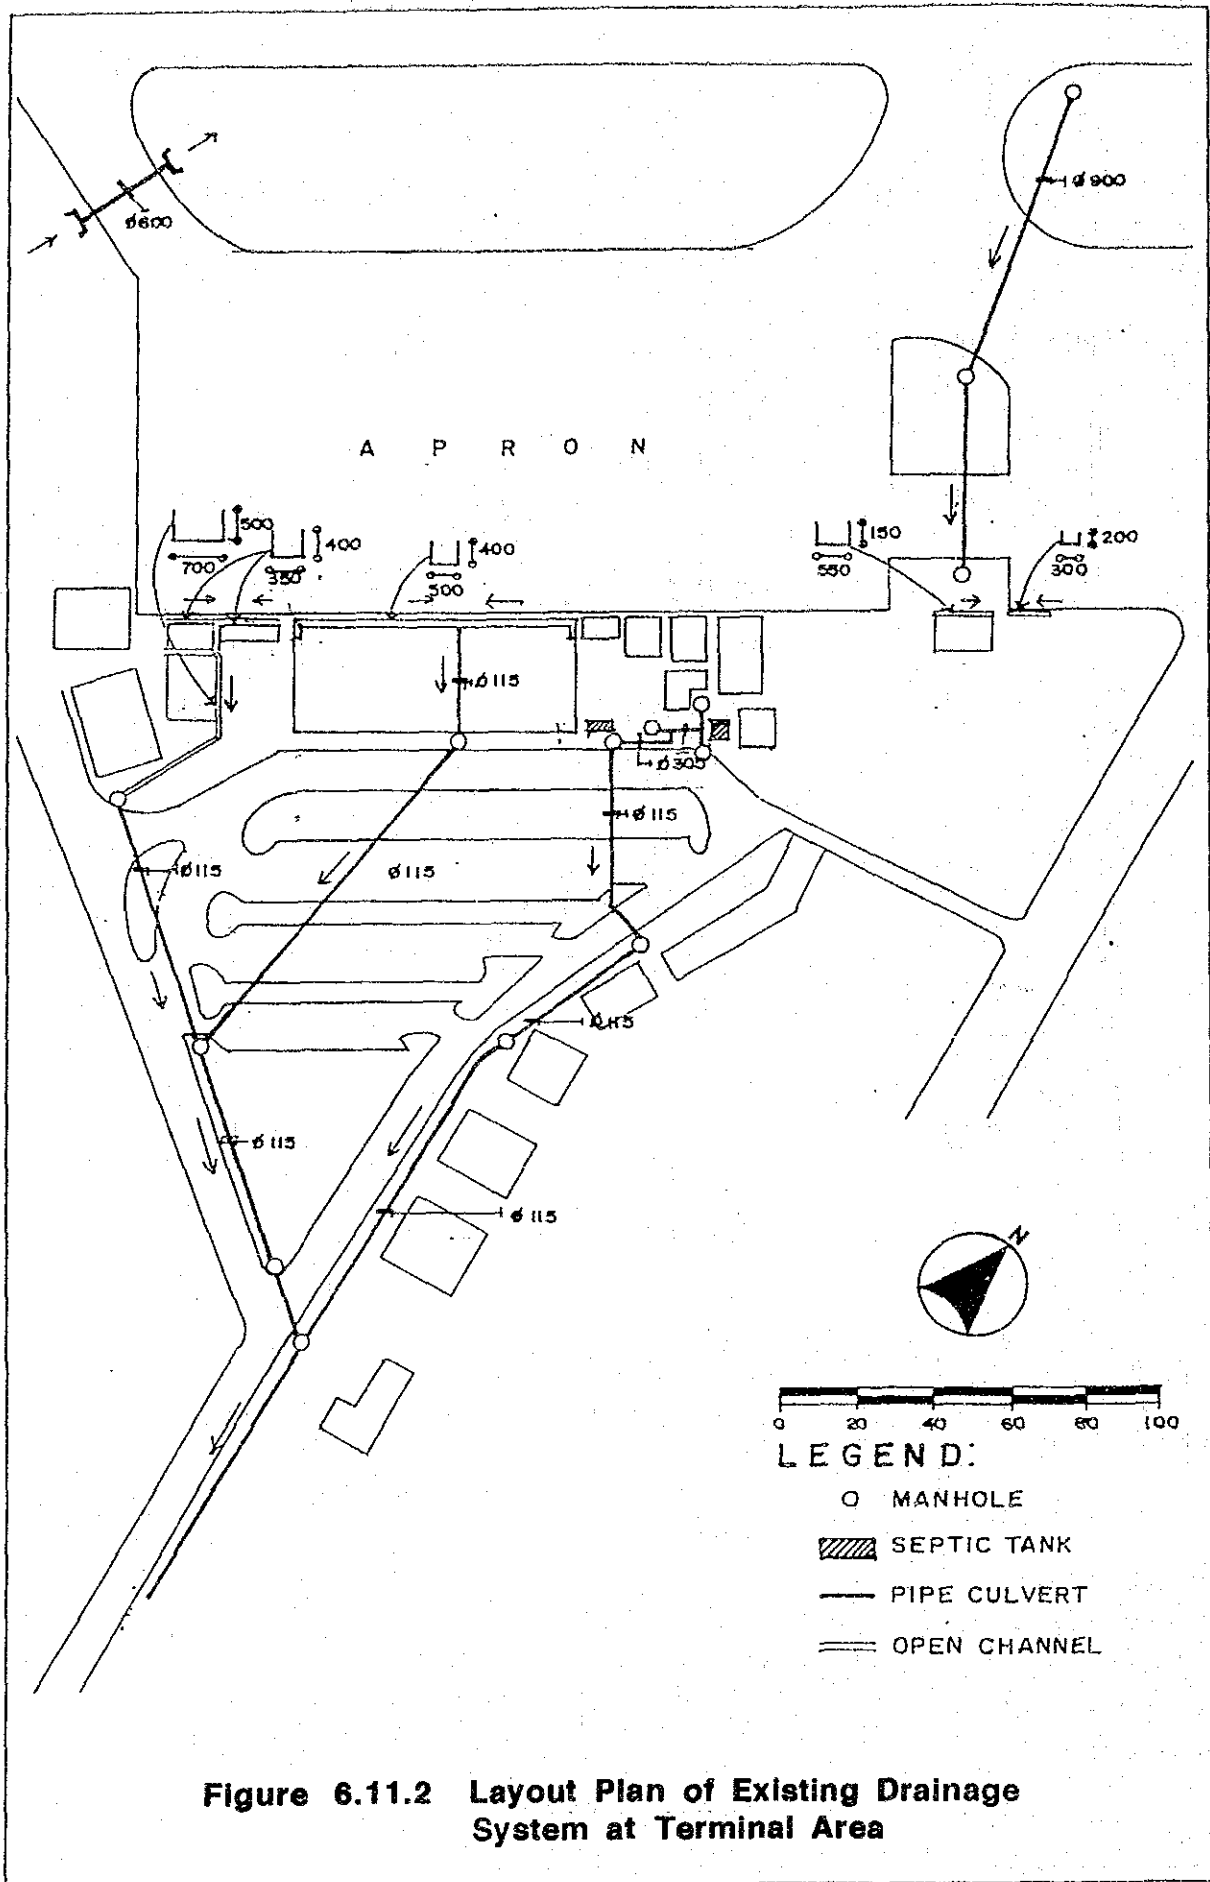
Layout Plan of Existing Drainage System at Terminal Area
